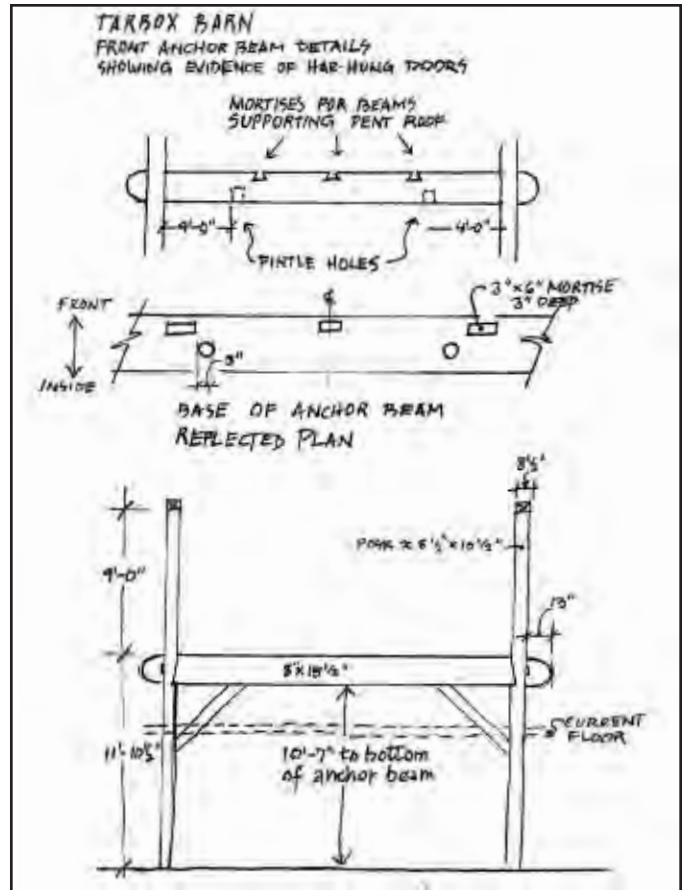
Anchor beam details, and section, showing H-bent (Ned Pratt).
